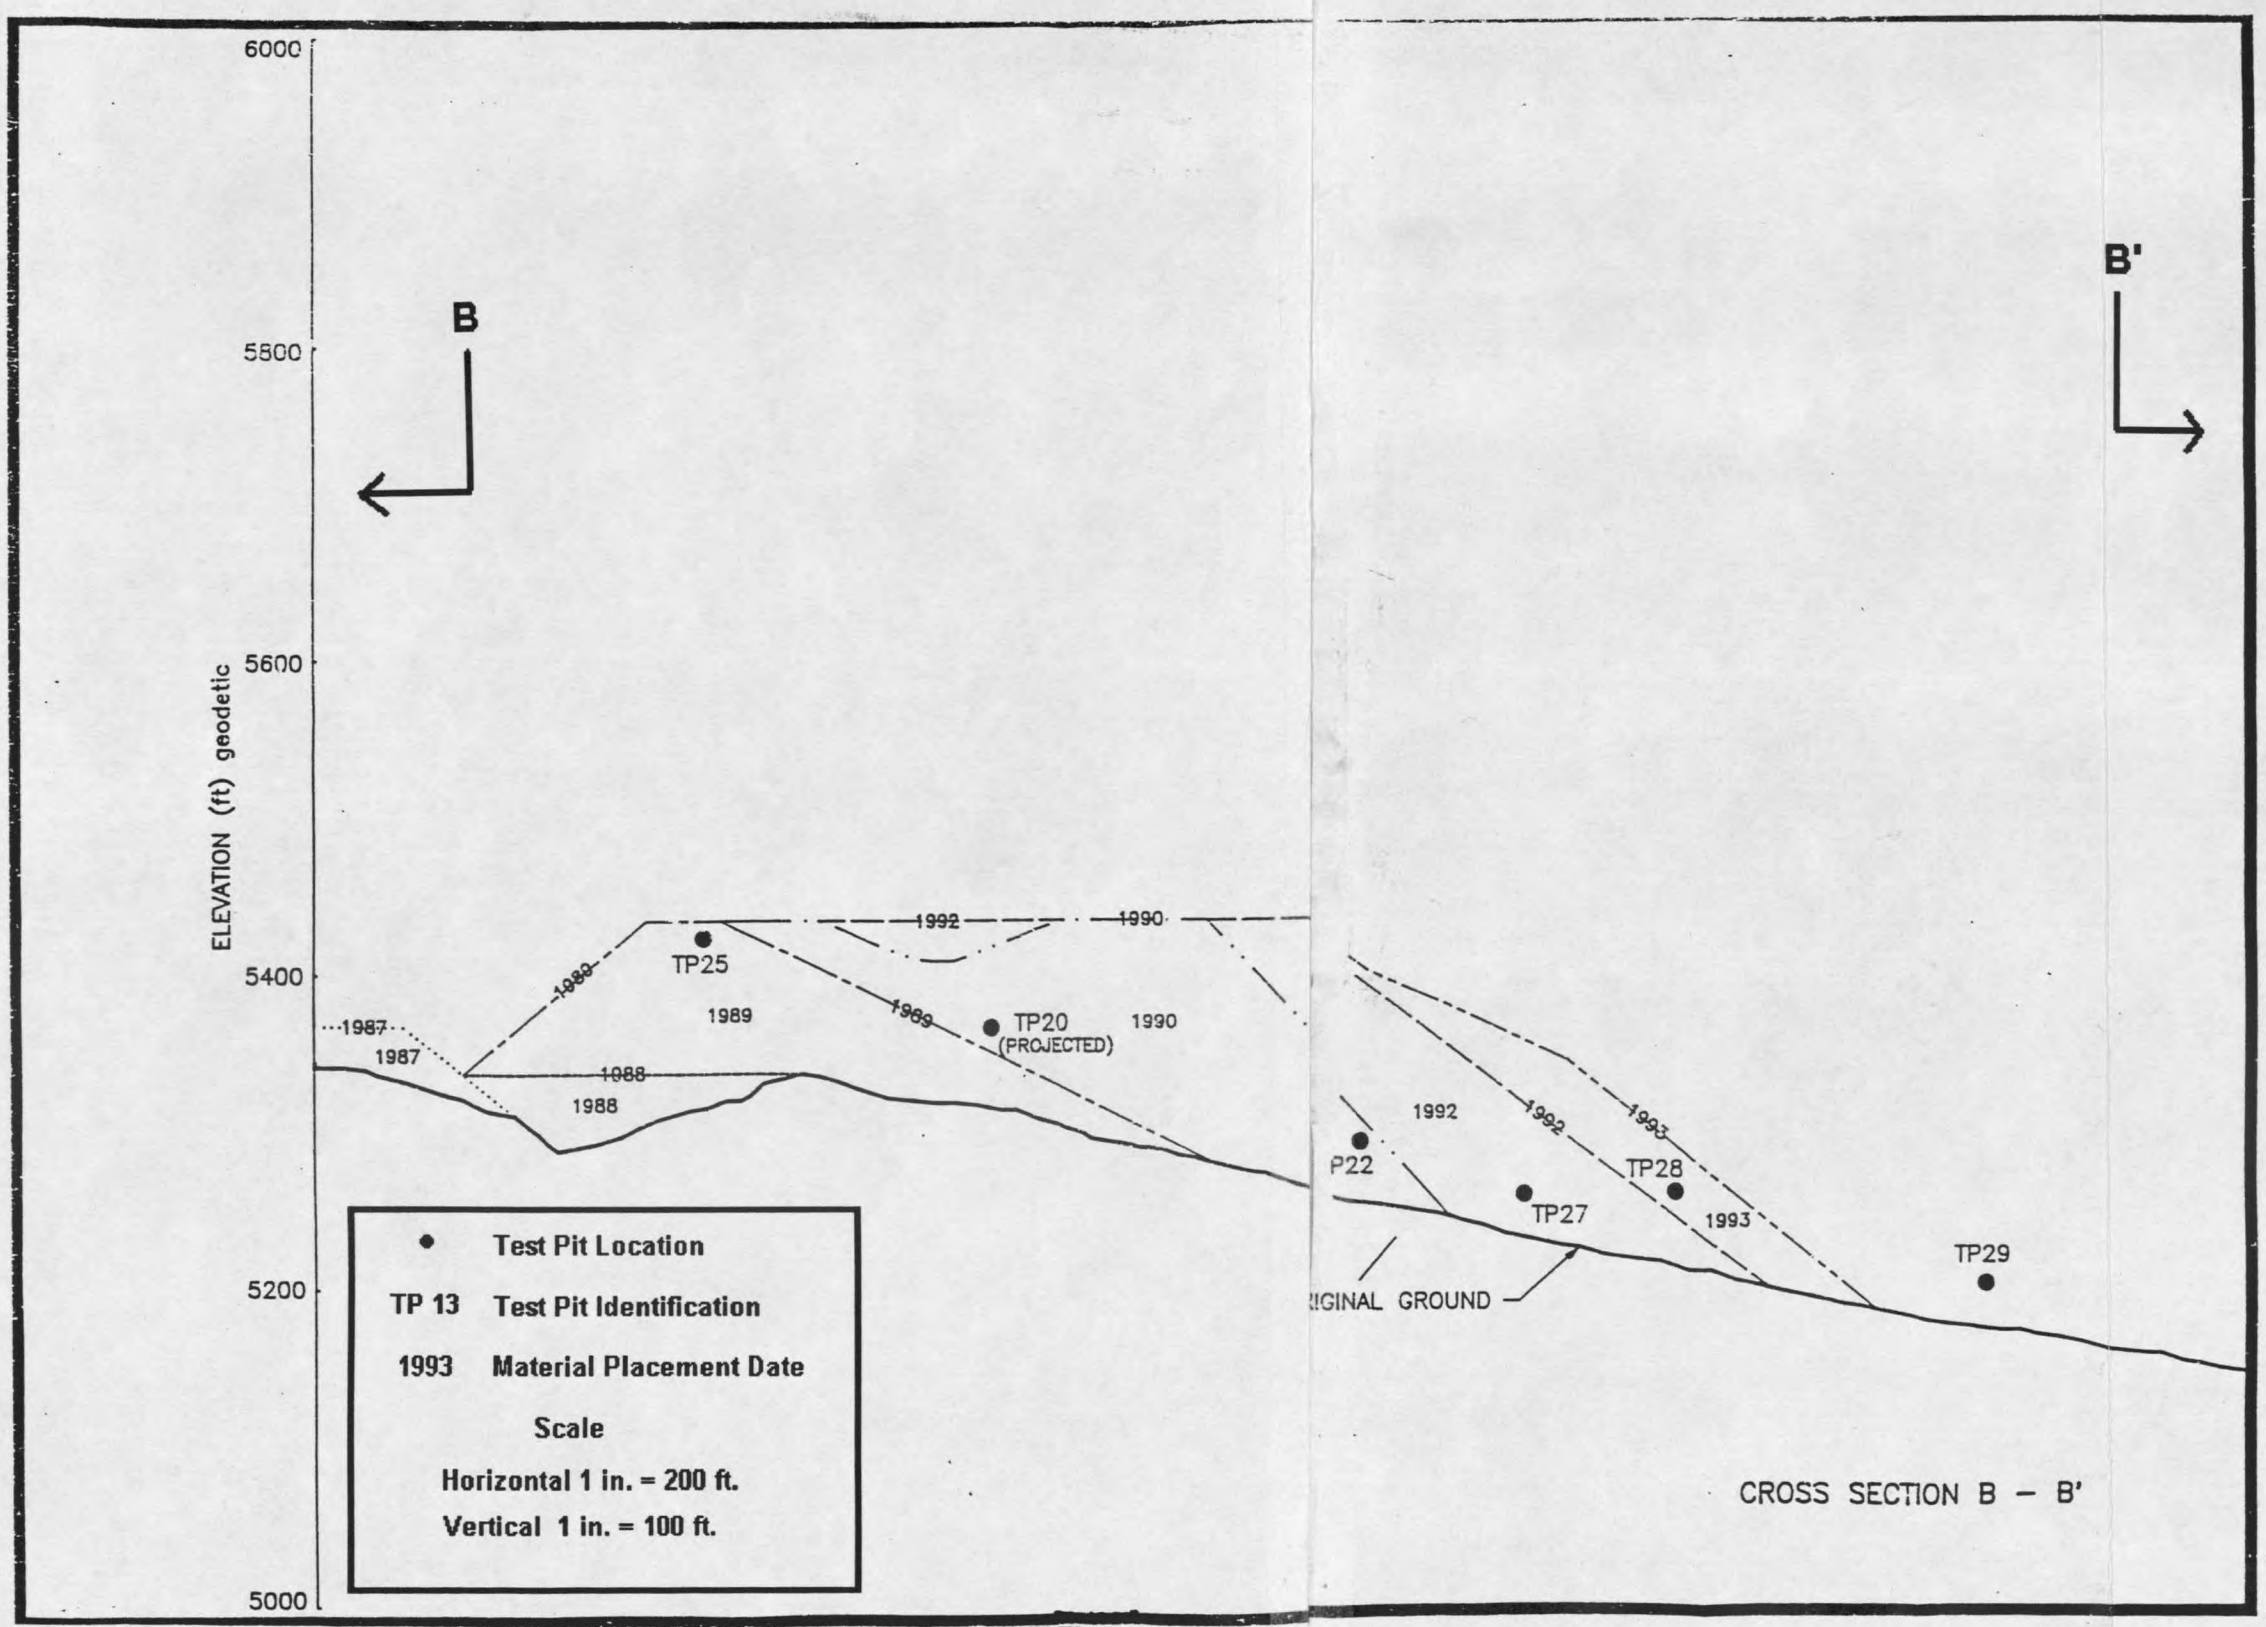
View of waste rock repository vertical plane through cross section B - B'.
